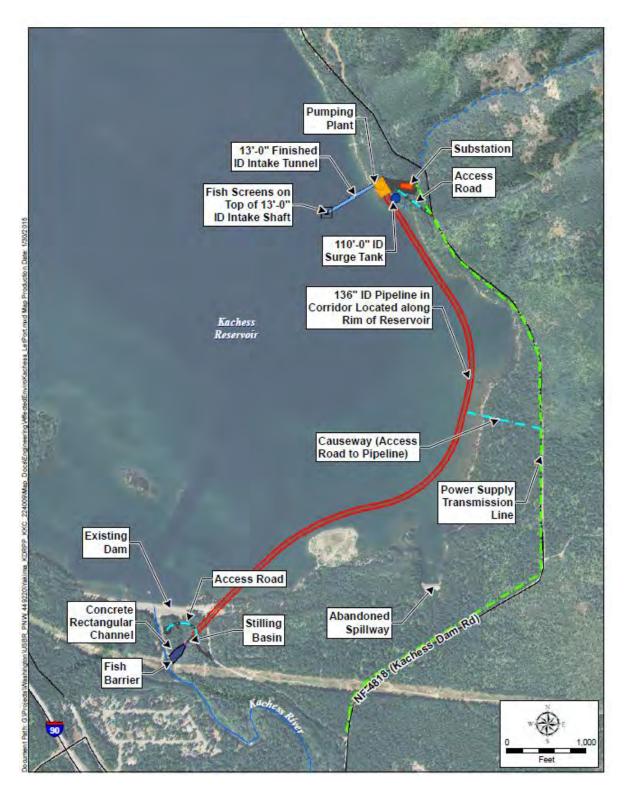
Plan View of Alternative 1, East Shore Pumping Plant
